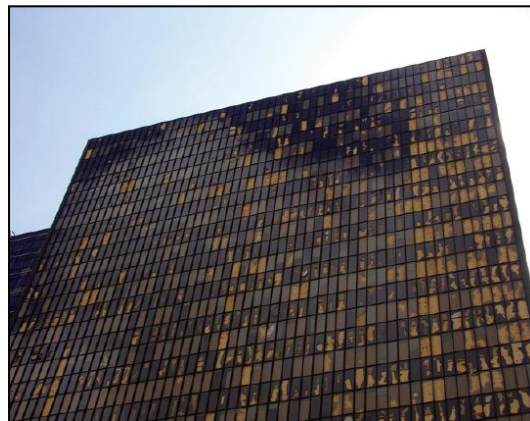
is a sample of the window glazing damage that occurred to the Hyatt Regency Hotel, one of the most heavily damaged buildings. The figure shows a close-up view of the north façade with broken windows and spandrel panels: the non-structural metal panels that cover the exterior façade of a building in the area between floors.
